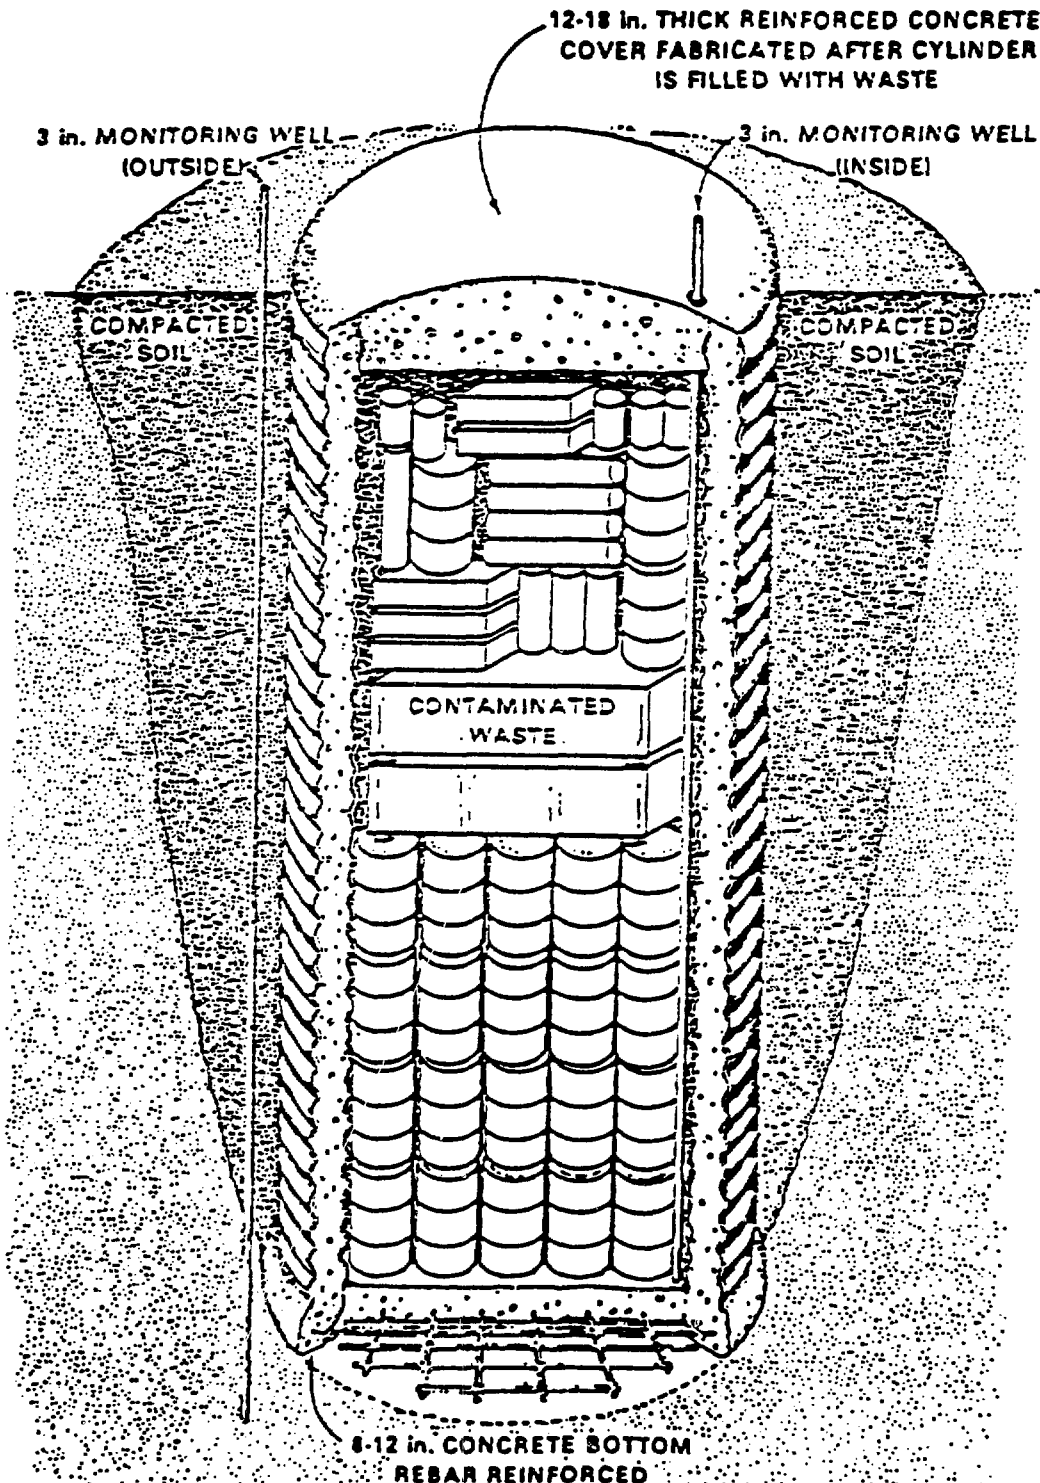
Schematic representation of an underground concrete silo in SWSA6.
